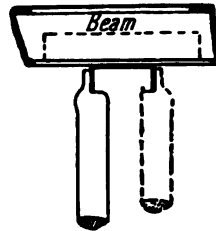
Arrangement for fitting Hold Shifting Boards between Pillars.
